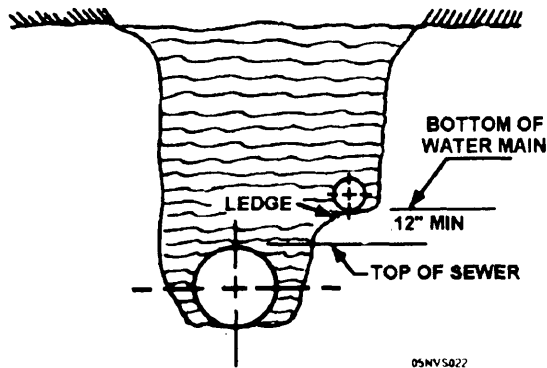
Building sewer and the water-service pipe in the same trench.
